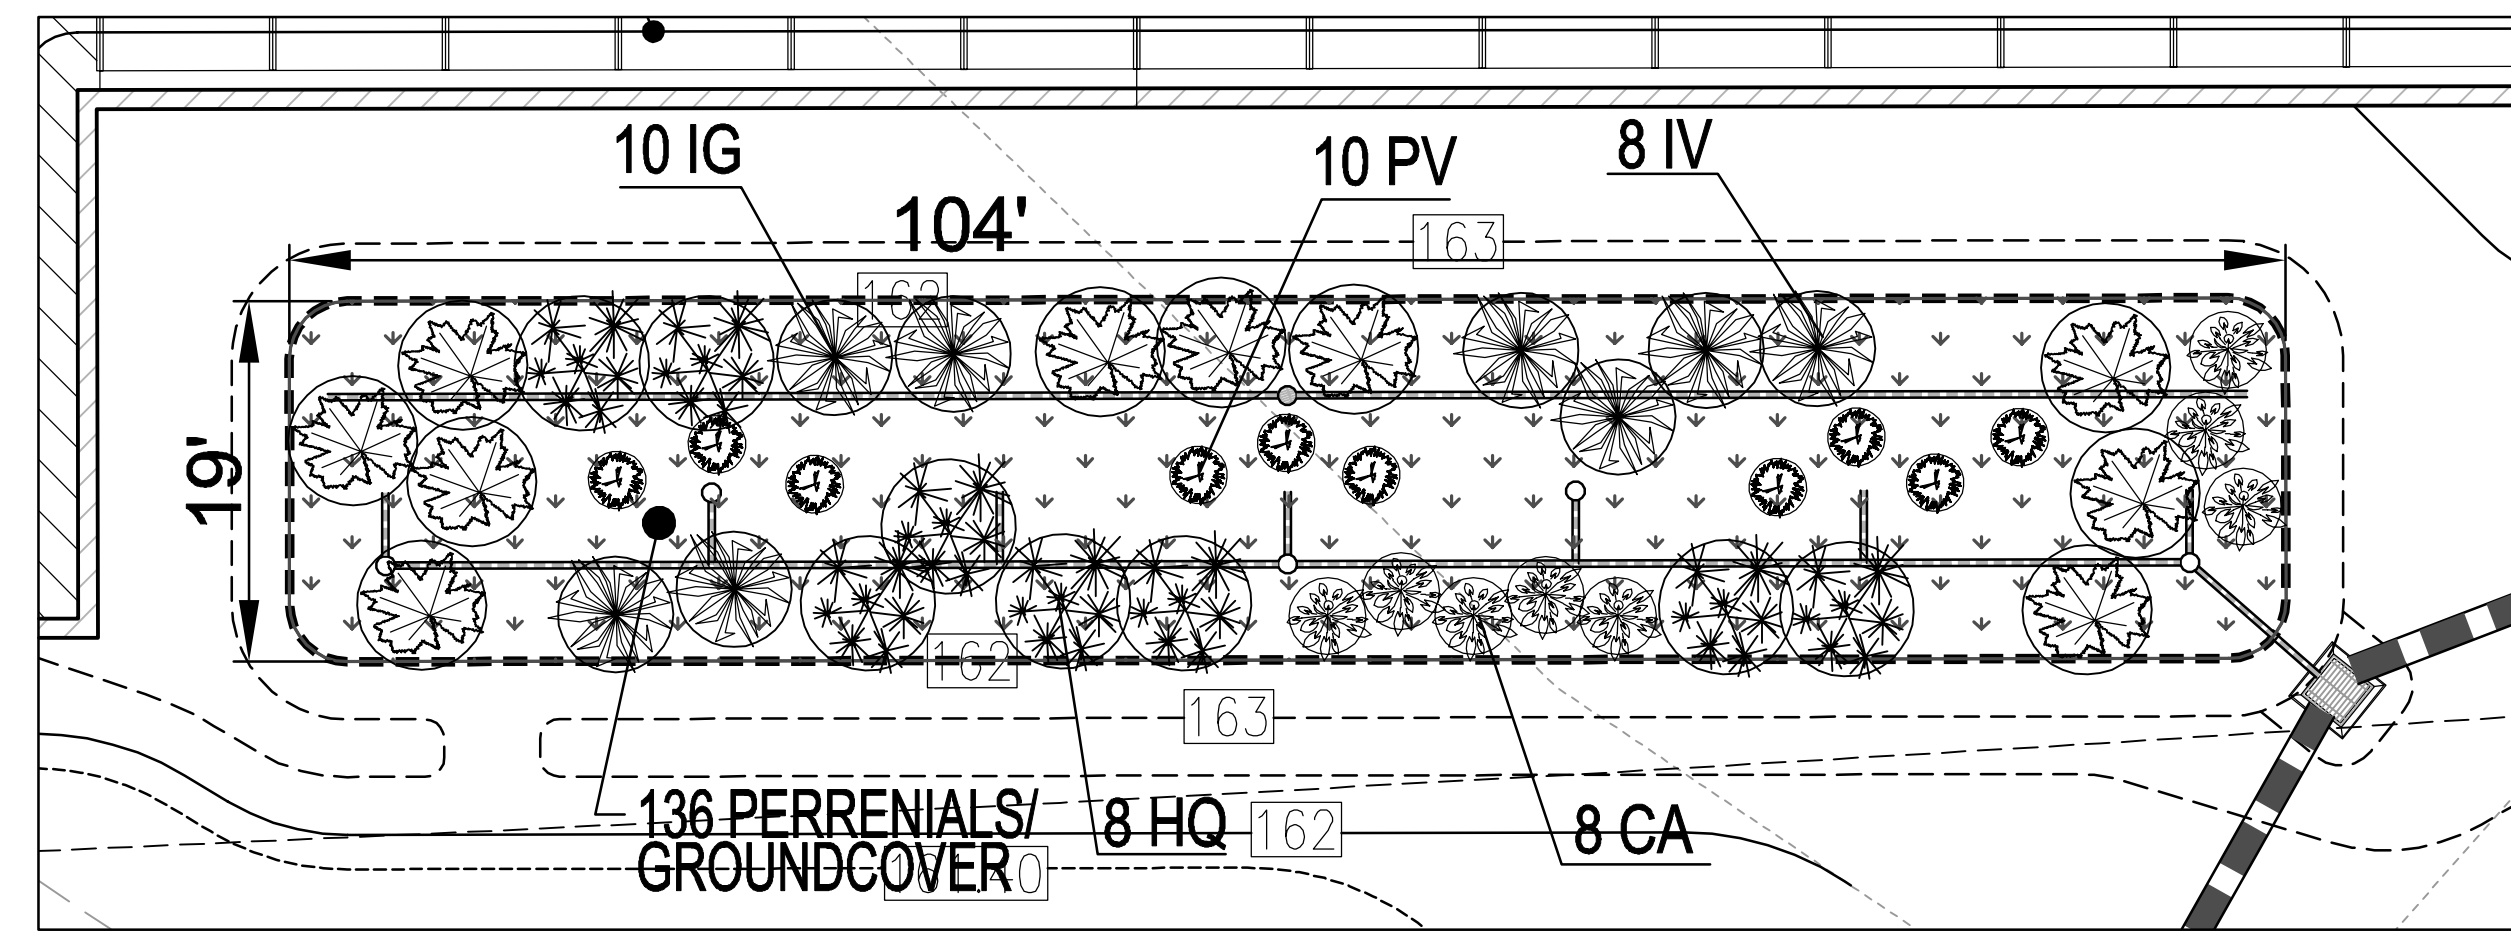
DETAILED BIO AND PLANTING PLAN (SWM #7)
